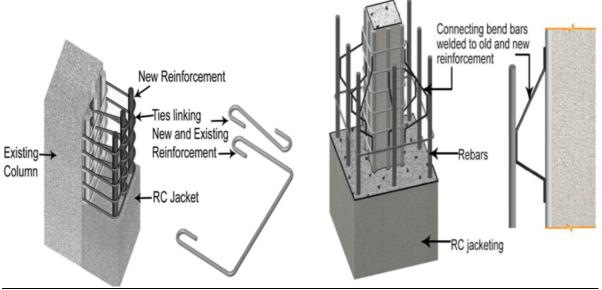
RCC jacketing of existing column (credit: TESRA ppt)
